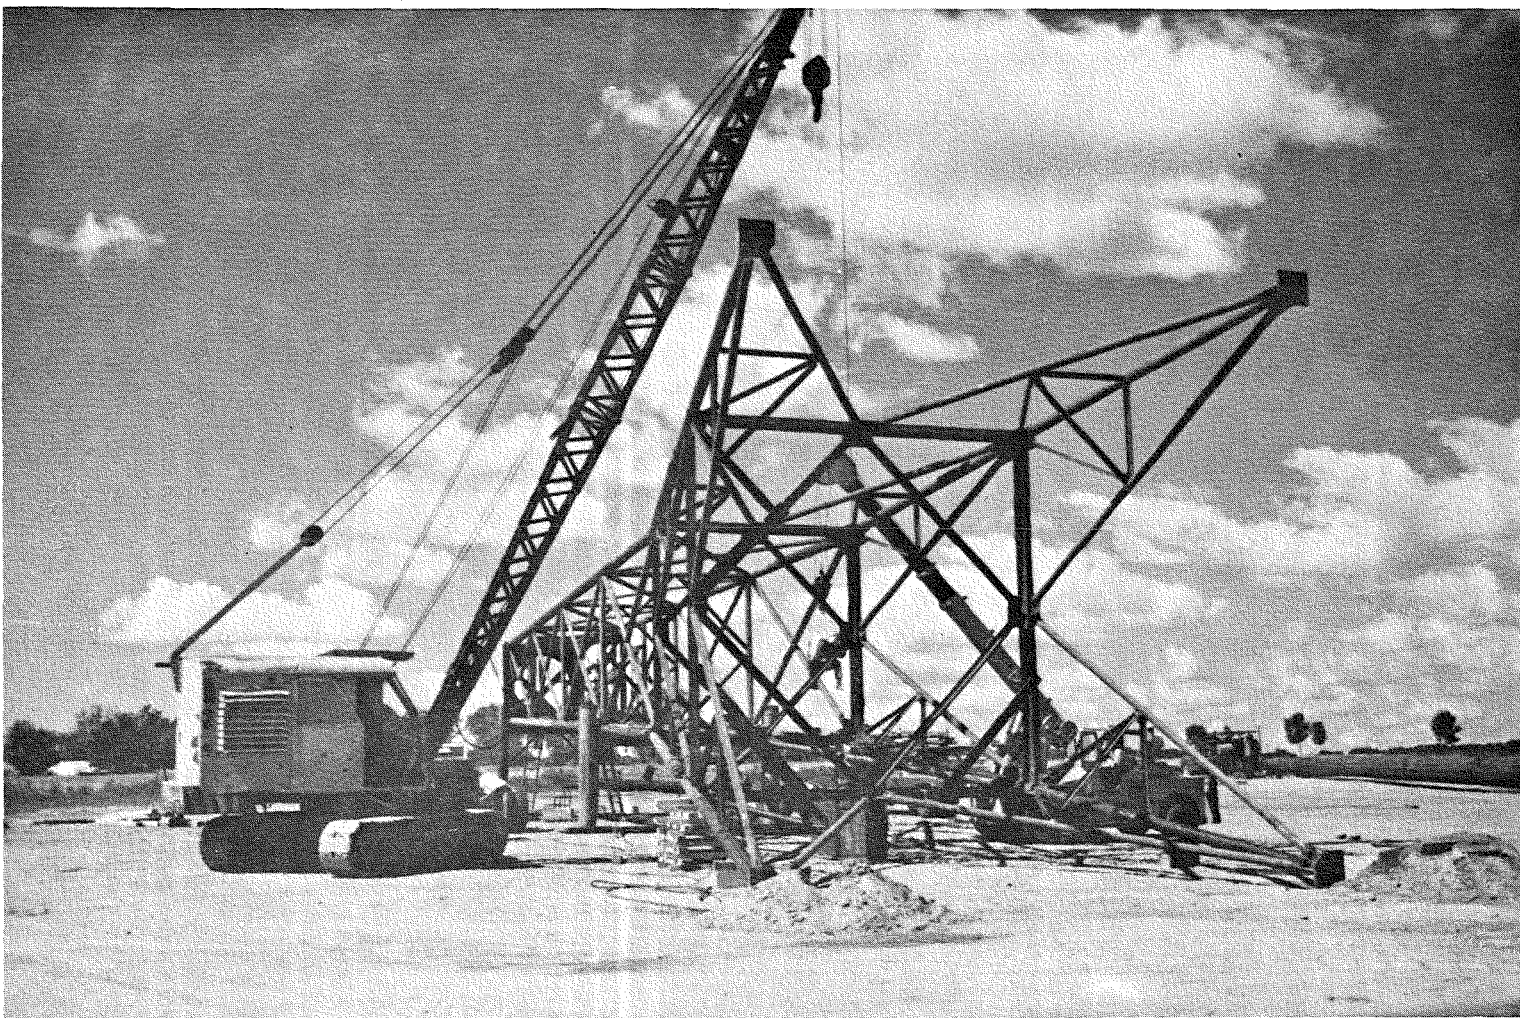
MOD-OA Tower During Trial Assembly at Manufacturer (Bottom View)
